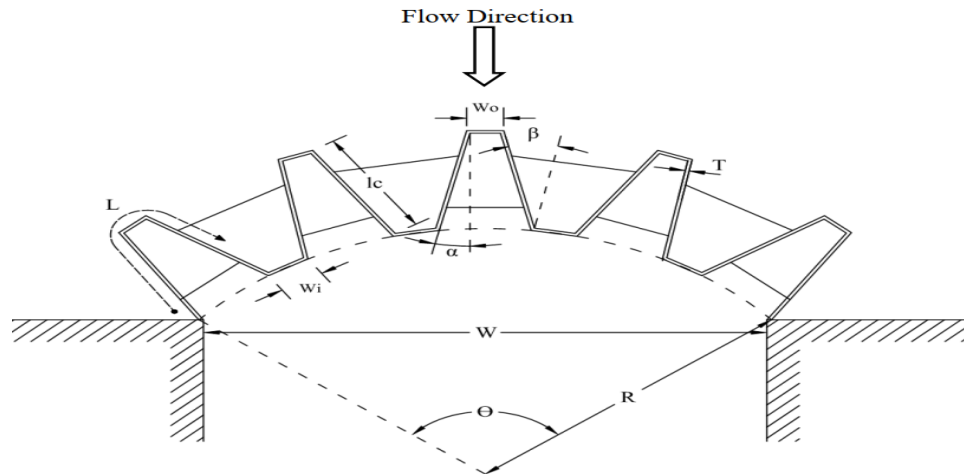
Geometrical parameters of arced trapezoidal piano key weir (ATPKW) in plan.
